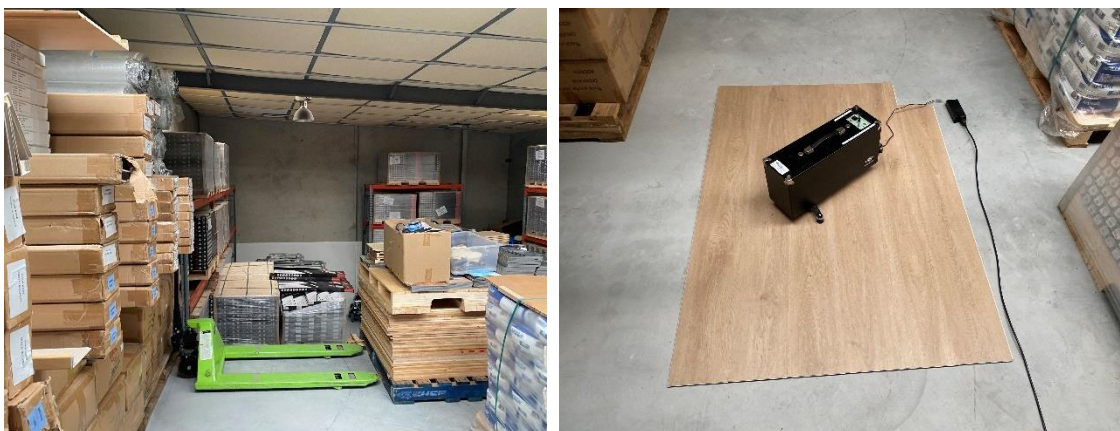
Photographs of Concrete slab above Office Photo 2 Tapping on Sample and Machine
